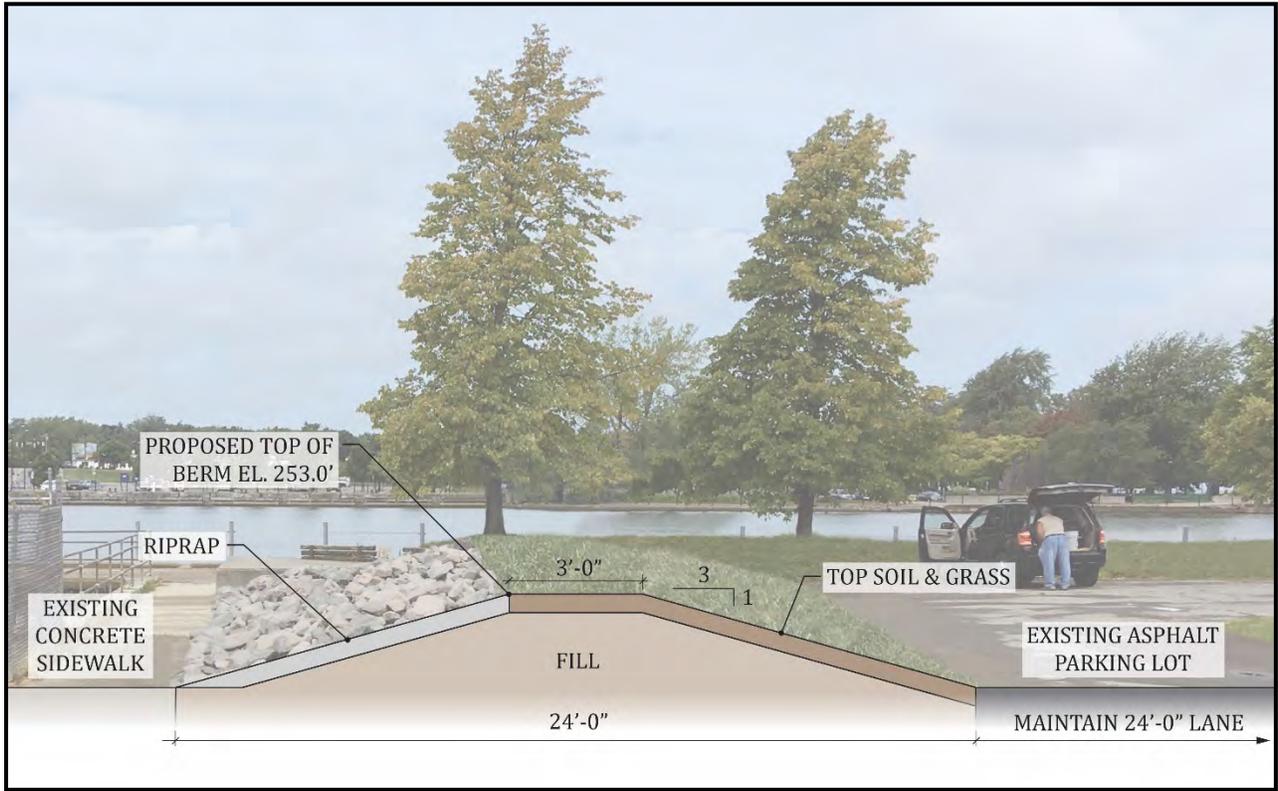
Section of Proposed Berm Structure at NYS-DEC Fishing Access Area - Riprap
